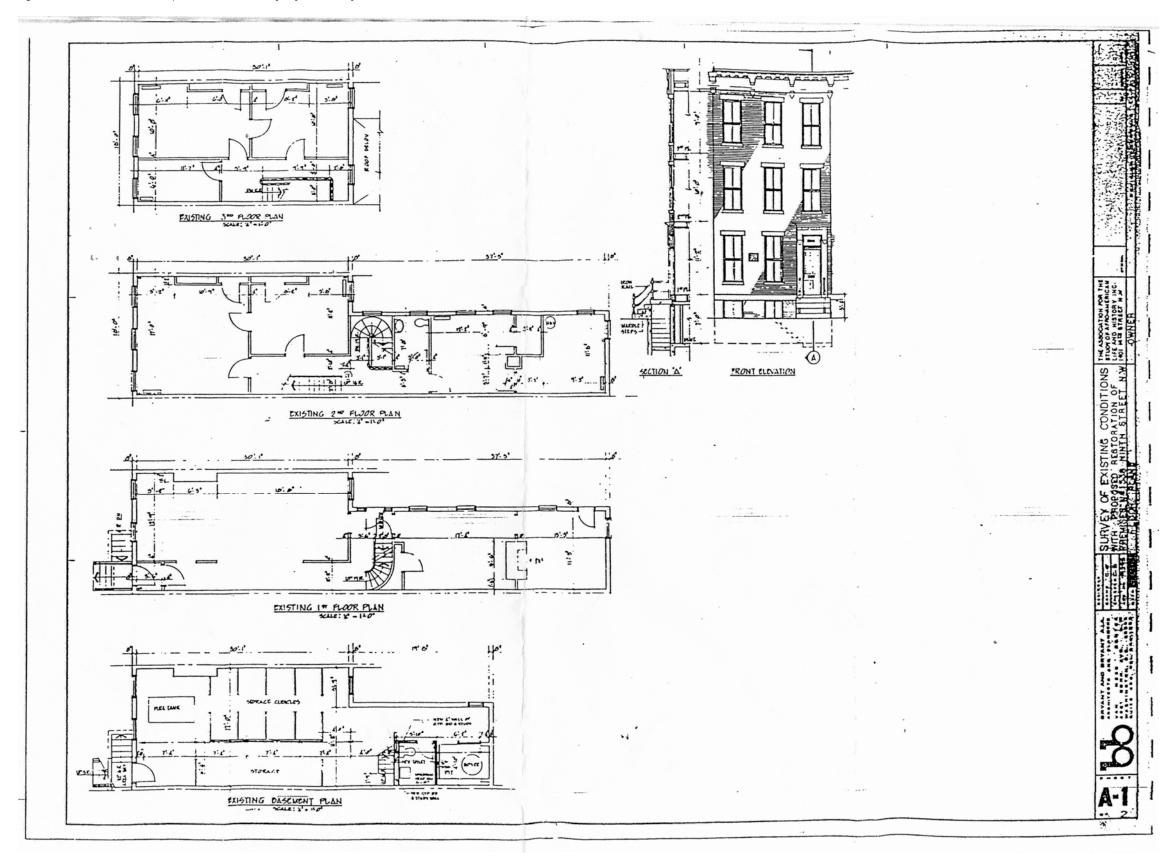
Permit drawings submitted by Princeton Electric, 5/19/1989; front elevation.
